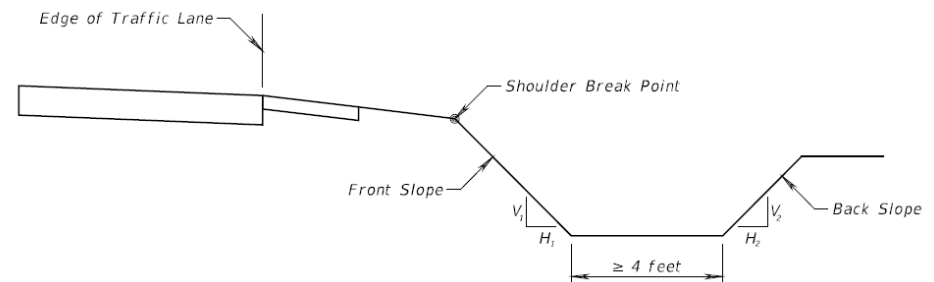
Roadside Ditches – Bottom Width ≥ 4 feet
